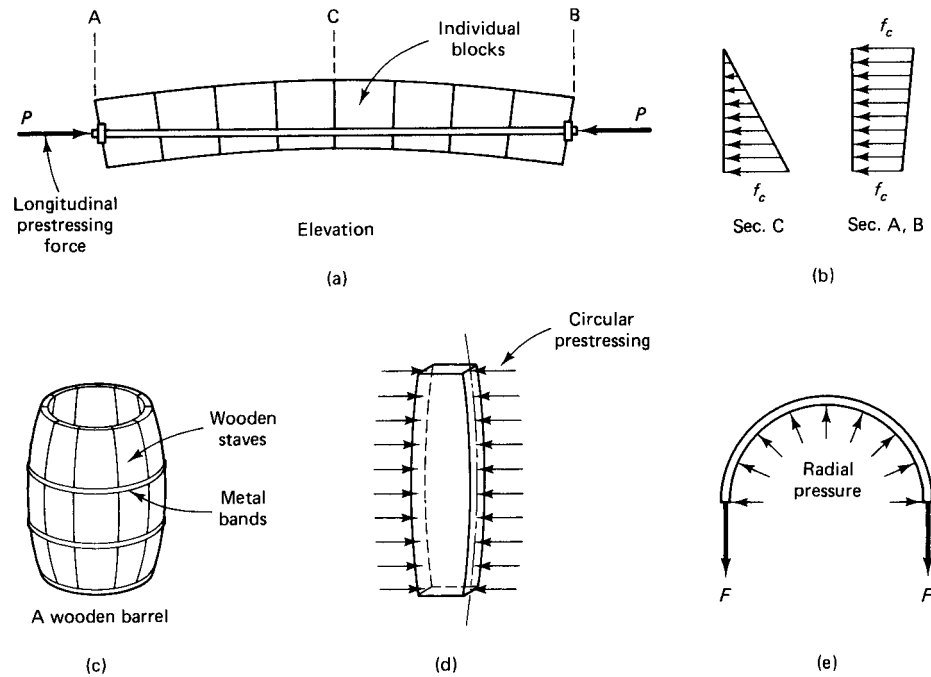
Prestressing principle in linear and circular prestressing. (a) Linear prestressing of a series of blocks to form a beam. (b) Compressive stress on midspan section C and end section A or B. (c) Circular prestressing of a wooden barrel by tensioning the metal bands. (d) Circular hoop prestress on one wooden stave. (e) Tensile force F on half of metal band due to internal pressure, to be balanced by circular hoop prestress.
